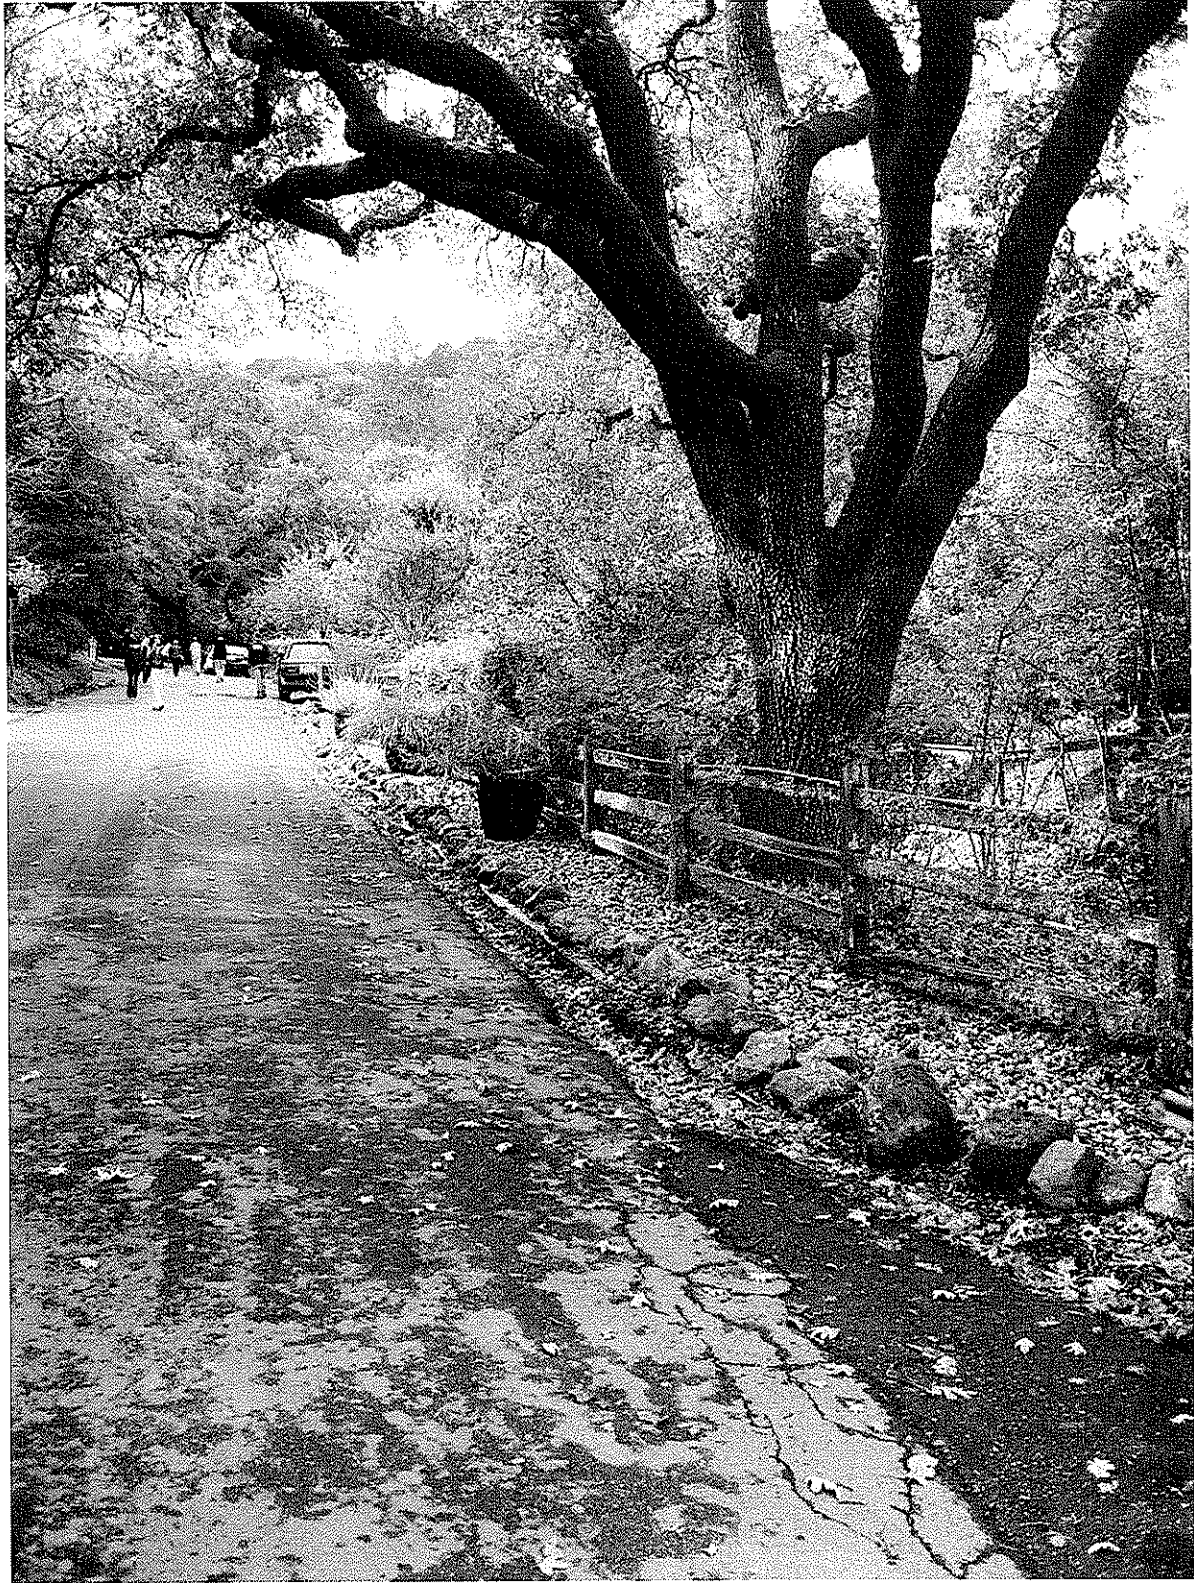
Overview of proposed storm drain alignment on North Lane, view to the southwest.
